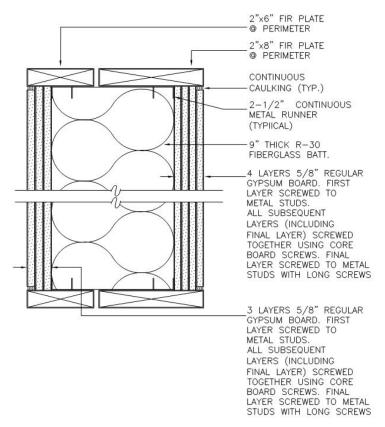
CHAMBER FILLER WALL CONSTRUCTION (DETAIL COURTESY OF WEAL)
